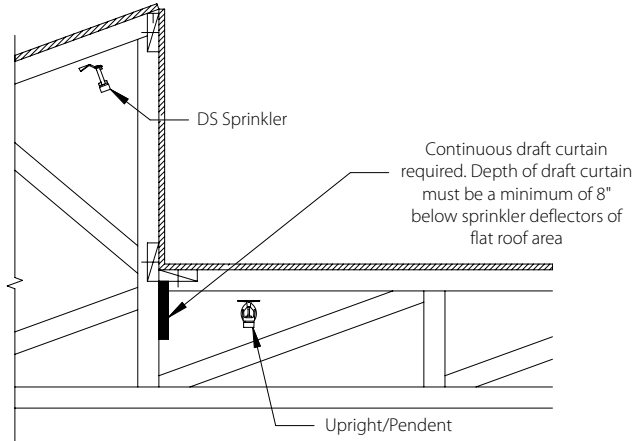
A: SINGLE SLOPE TRANSITION WITH FLAT ROOF BELOW PEAK
